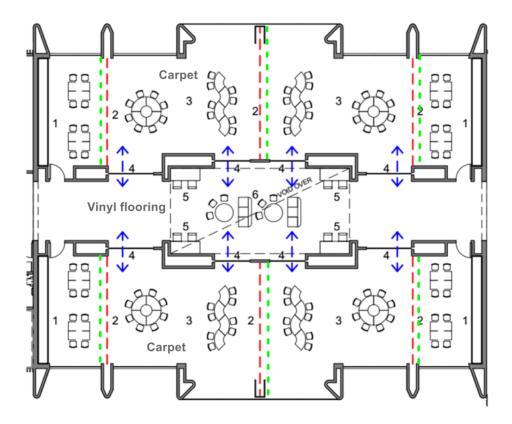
Floor plan of a typical modular classrooms with recommended secondary tracks for removable wall panels
